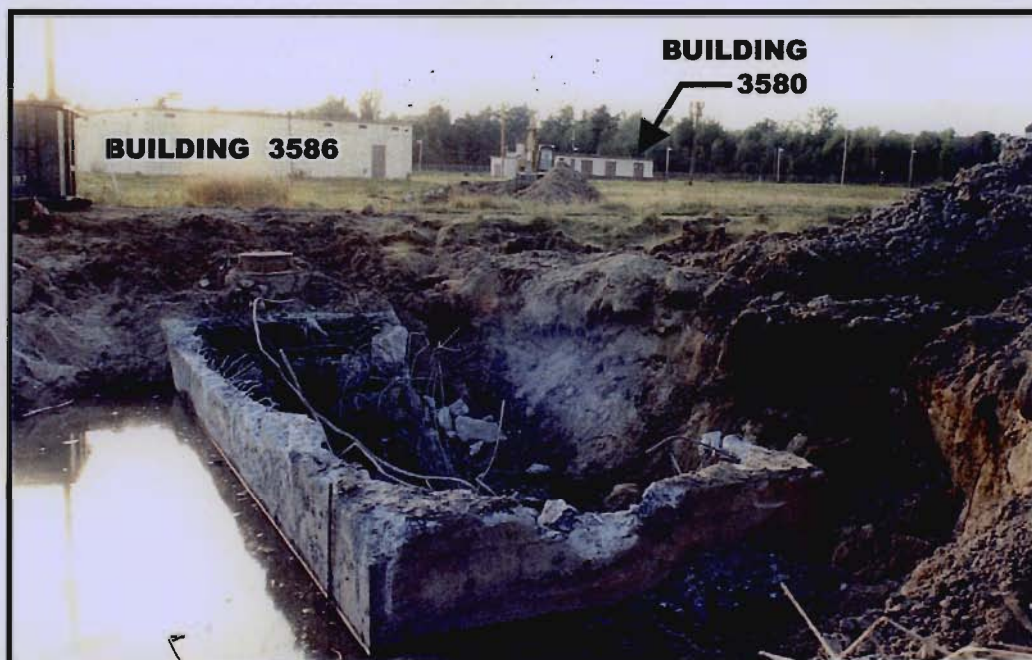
Westward view of excavated 7,500 gallon septic tank and excavation of piping leading from septic tank to Building 3580 (September 1996).
